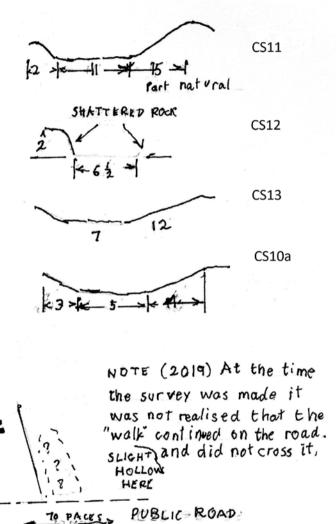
Nine stiles walk – cross sections 10a–13 (not to scale).
